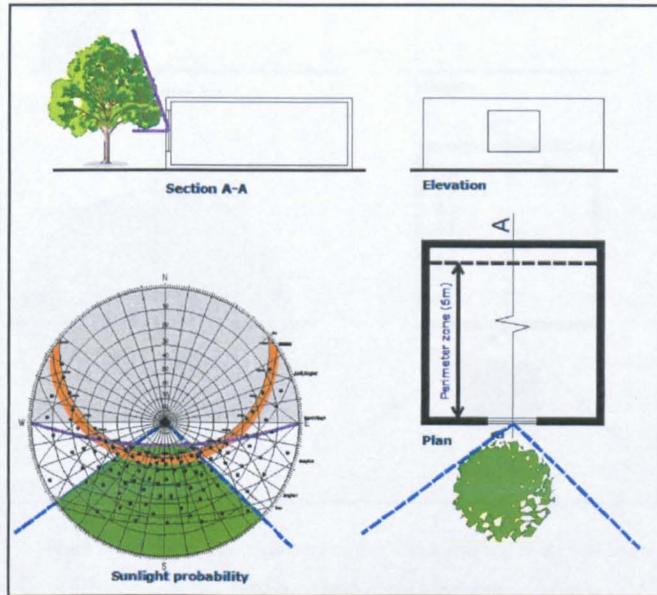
Plan, elevation and section of a classroom which faces the south and is overshadowed by a tree
